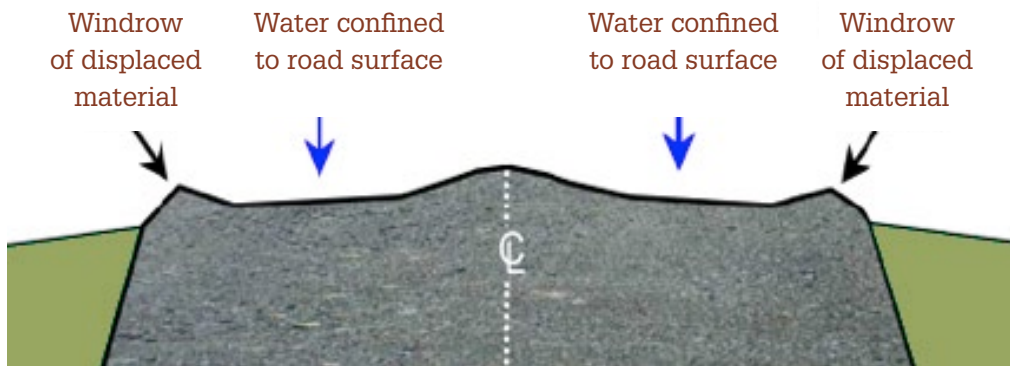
B. Centerline crown has become misshapen over time. Road surface drainage is trapped on the road by gravel movement, grader berms or by road rutting under heavy traffic. Road drainage travels down the rutted road surface causing erosion, loss of road material, and increased maintenance. The road can be reshaped to restore cross drainage, but rolling dips are needed for effective, permanent surface drainage (Center for Dirt and Gravel Road Studies, 2005).
